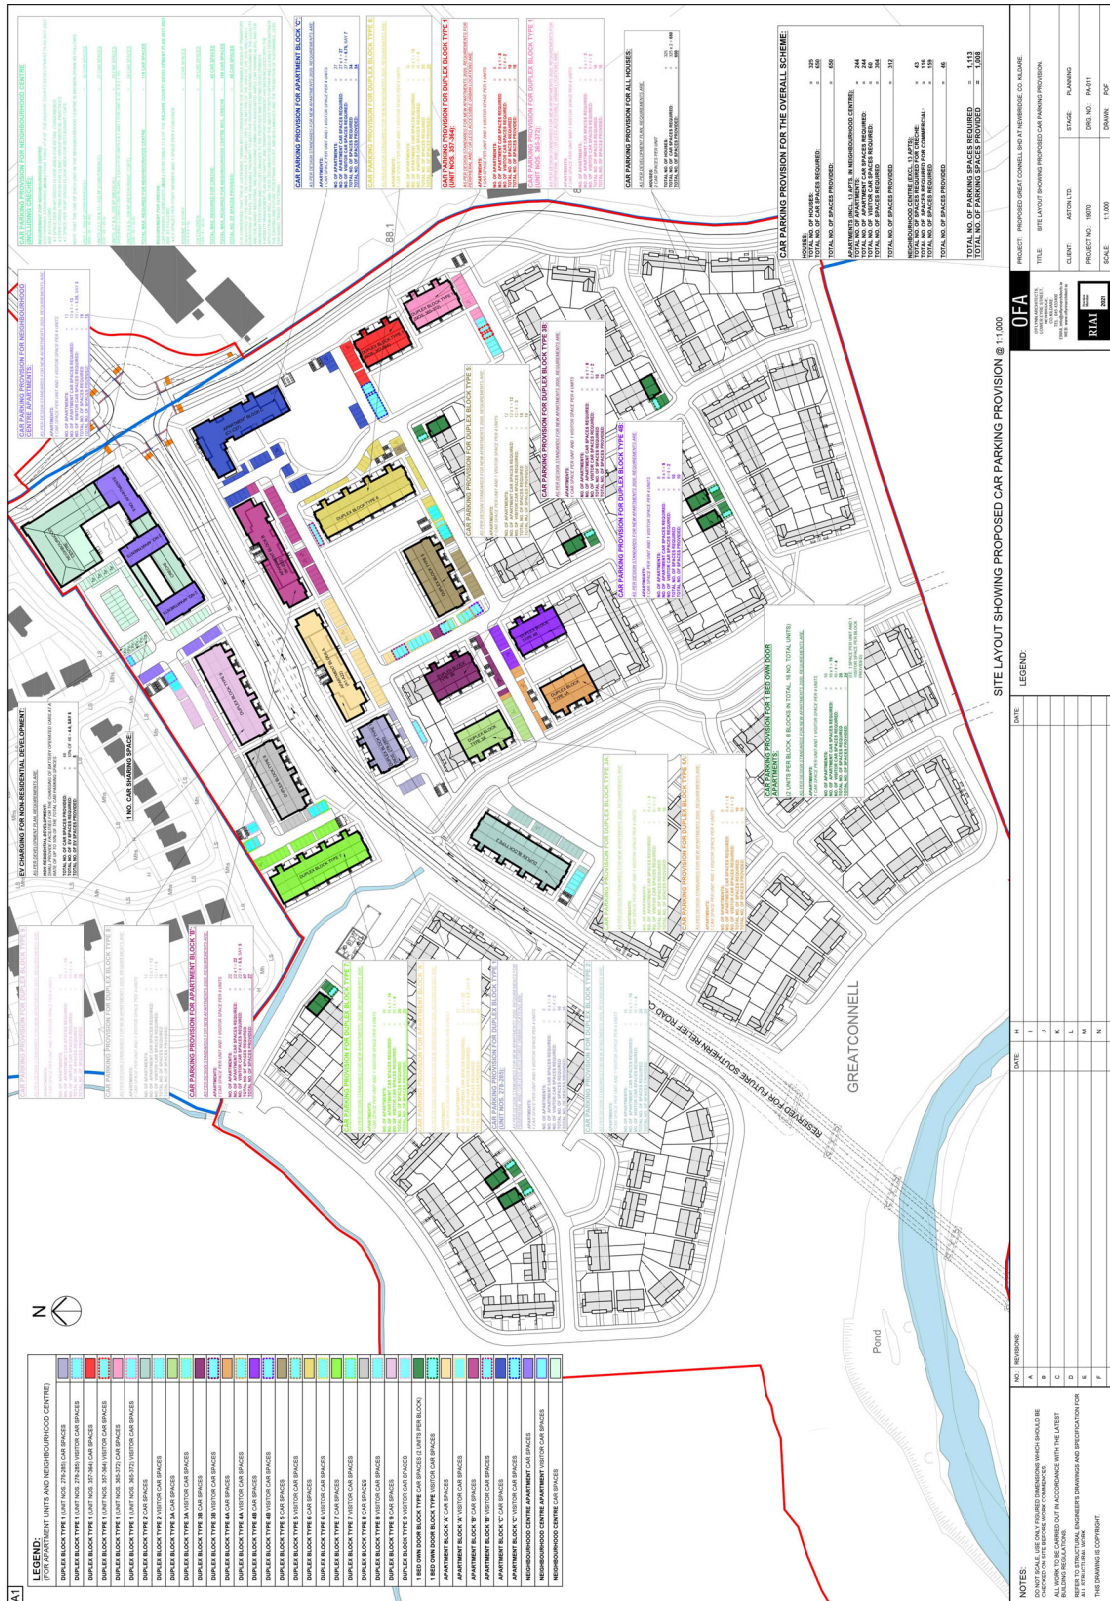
Drawing of the proposed car parking provision (drawing no. PA-011).
